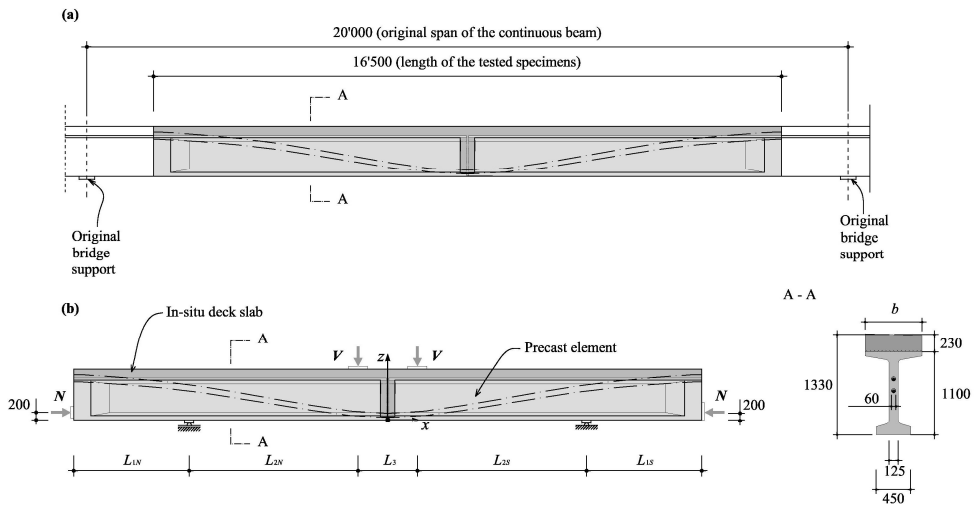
Tested specimens, dimensions in [mm]: (a) main dimensions of the original bridge and of the extracted specimens; and (b) test setup and cross-section detail
